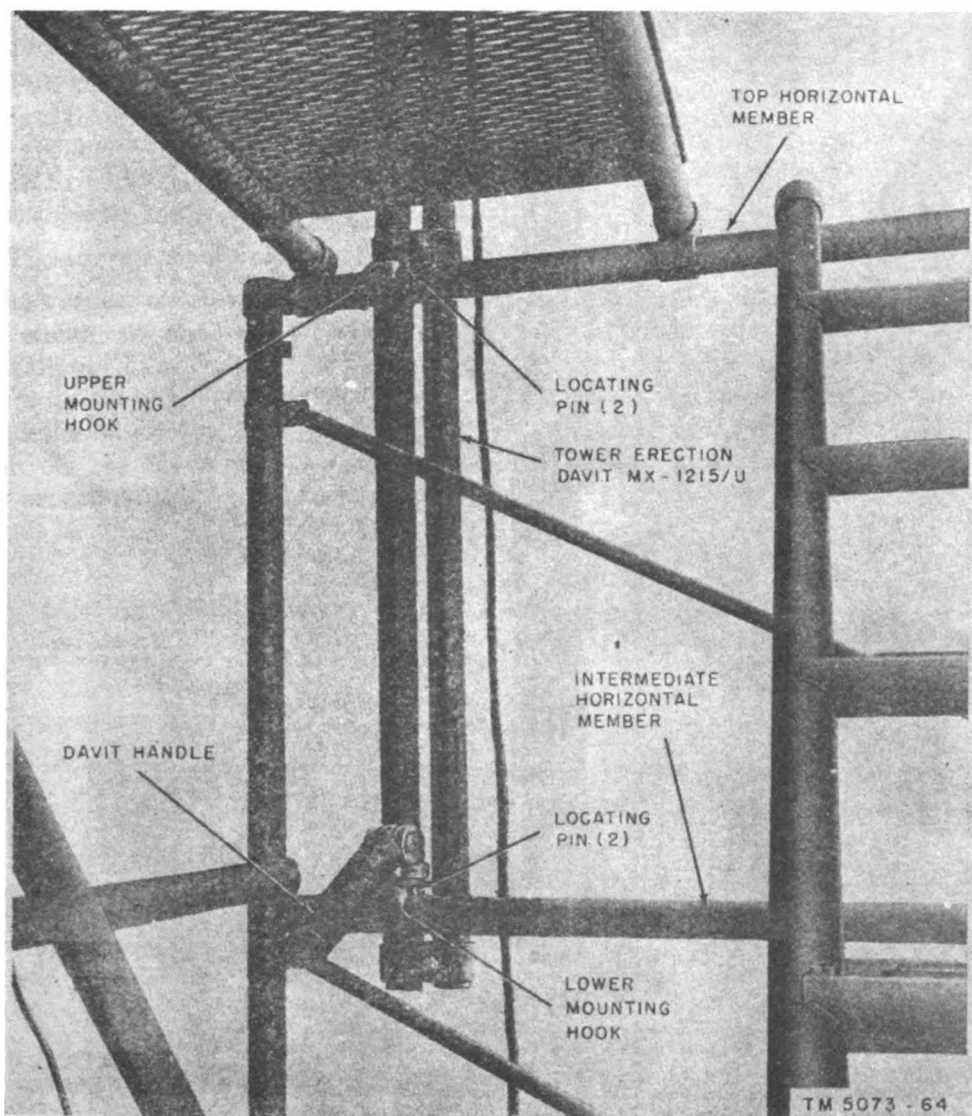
Normal davit installation, showing mounting hooks and locating pins.
